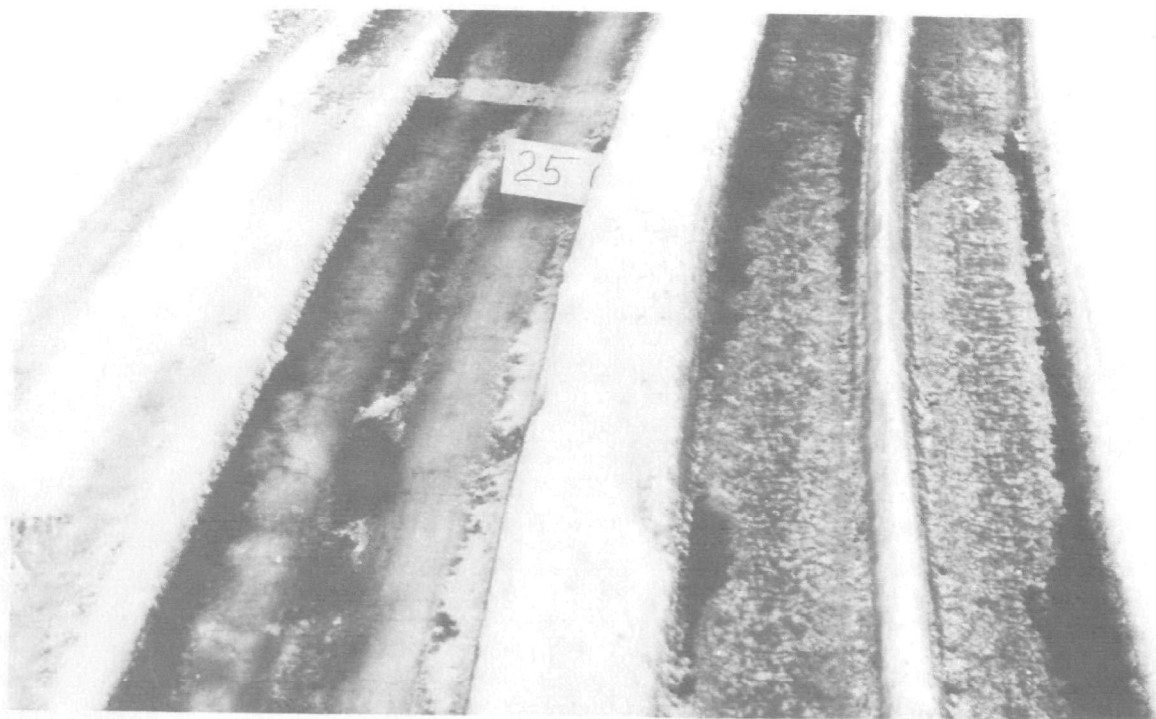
Section 25, 03/13/77. Note the "fatigue cracking" of ice in the wheel paths.
